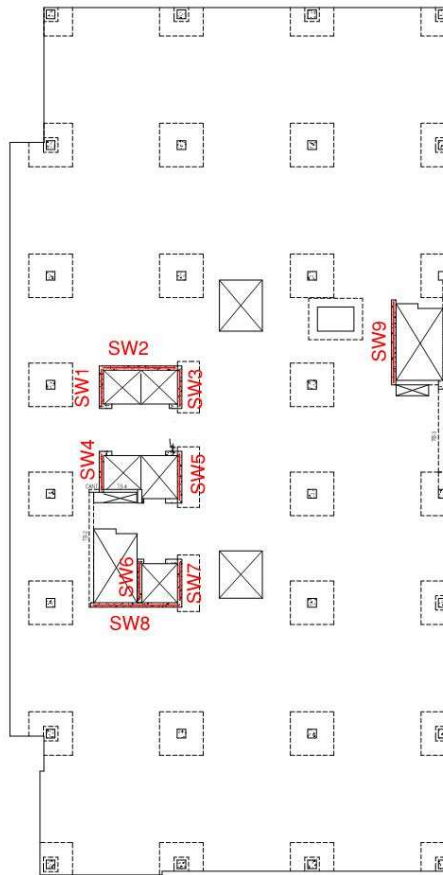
First Floor plan with highlighted shear wall locations
